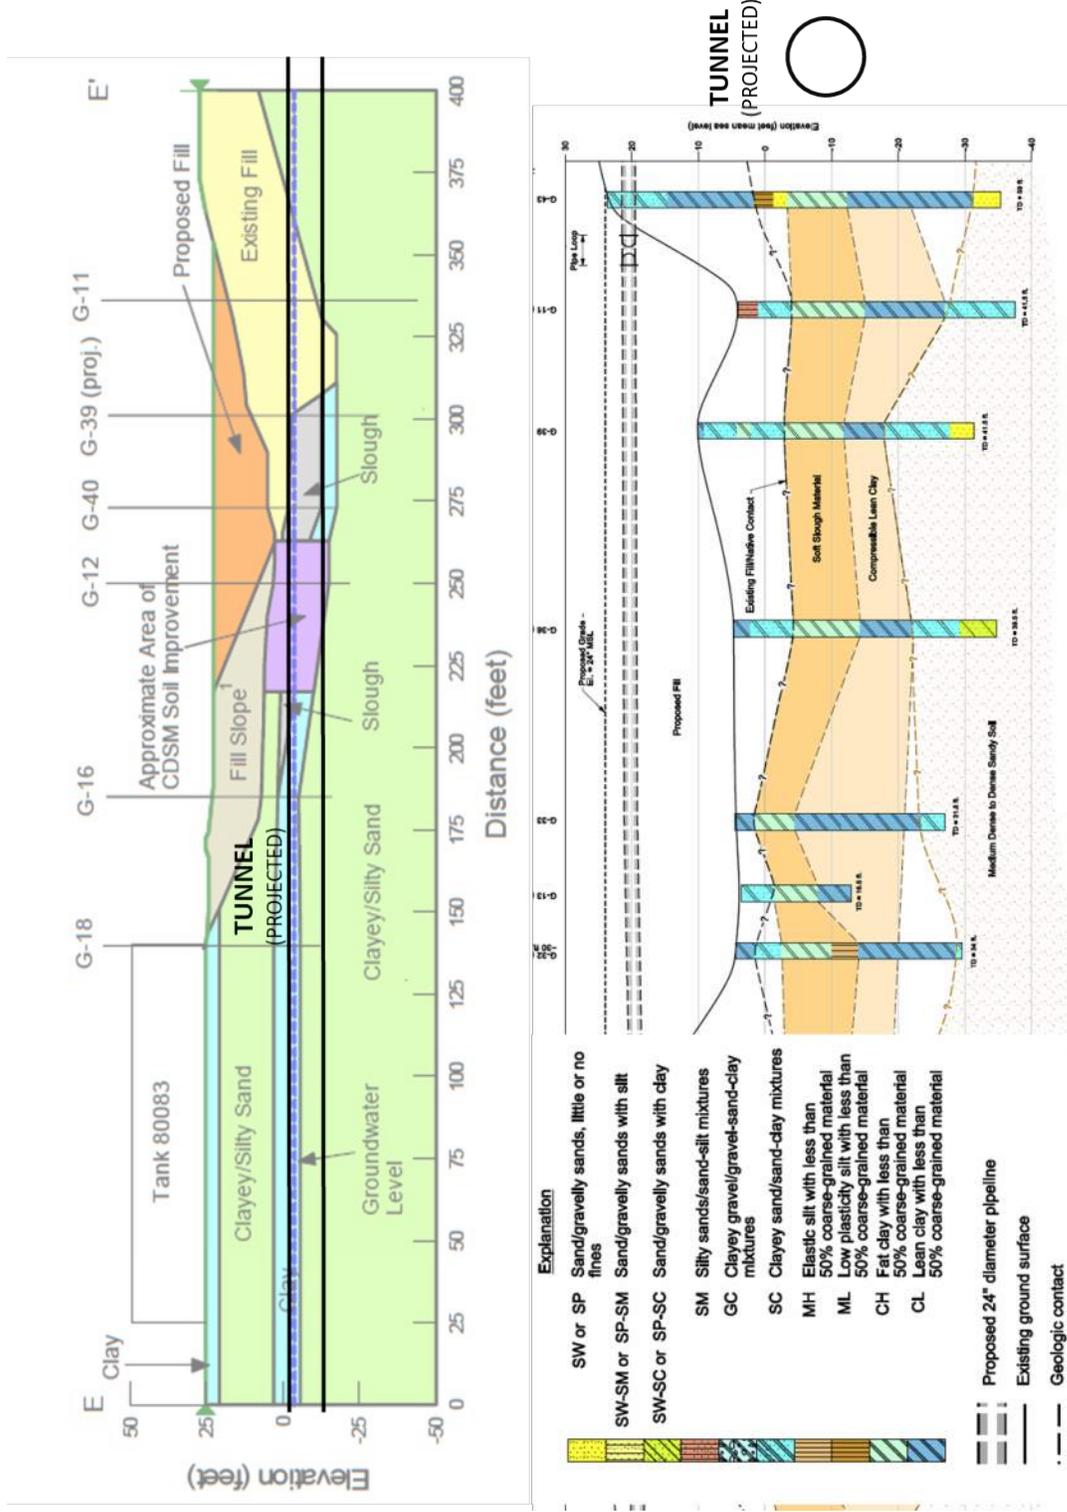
AMEC cross section through slough with proposed tunnel projected
